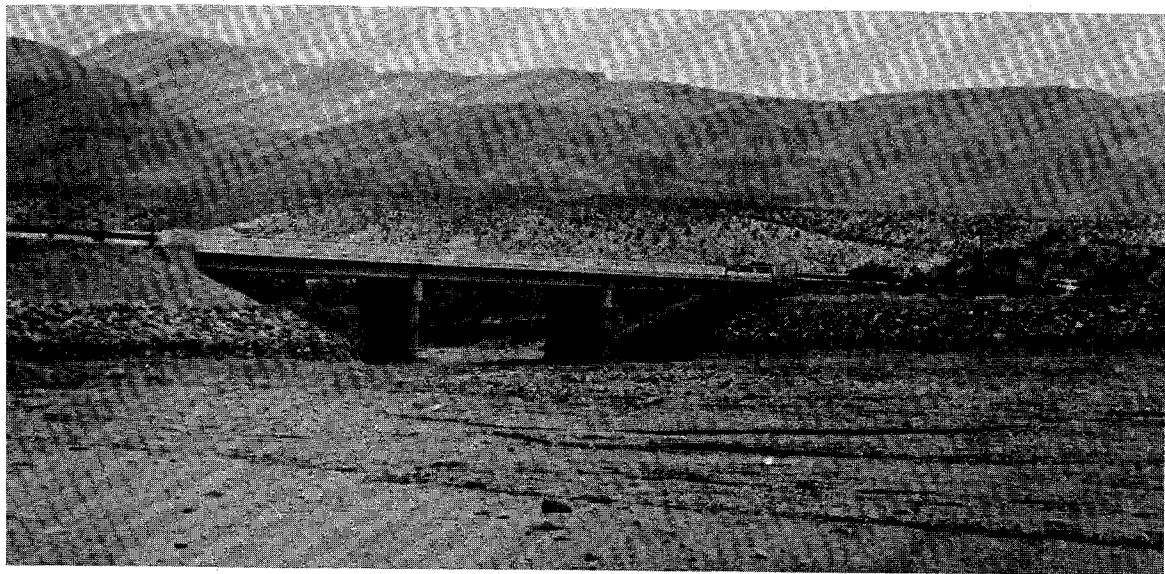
Downstream view of bridge and railbank protection after repairs following 1971 flood. (From Arizona Dept. of Highways.)
